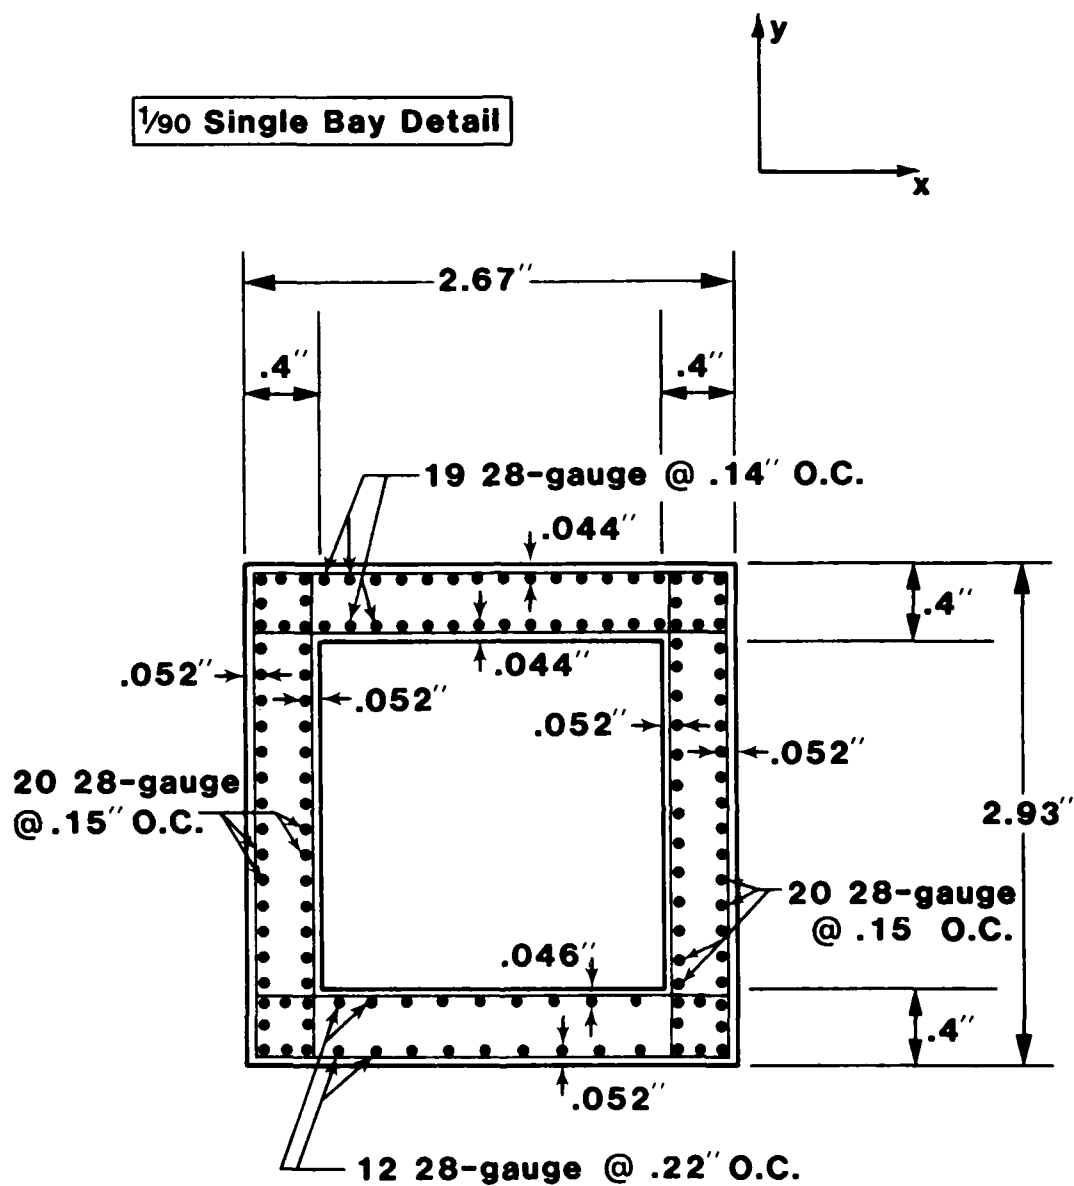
STRUCTURAL DETAILS - 1/90 SCALE SINGLE BAY MODEL
